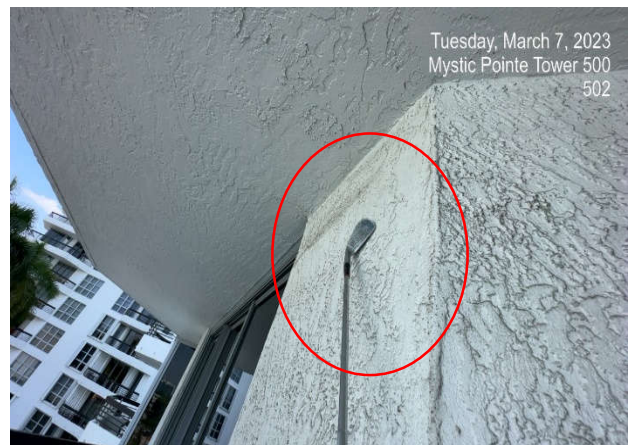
c.14 – Hollow and stucco delamination at balcony wall (Unit 502)
